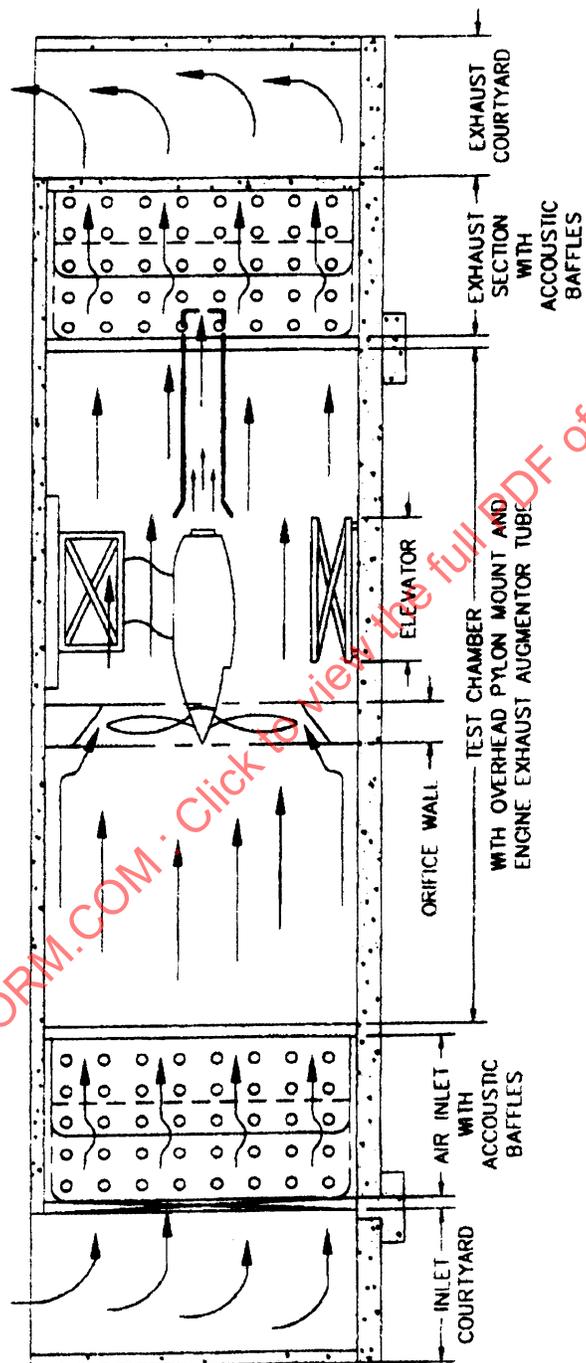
Turboprop Engine Test Cell With Horizontal Inlet and Exhaust Sections With Inlet and Exhaust Courtyards and Orifice Wall
